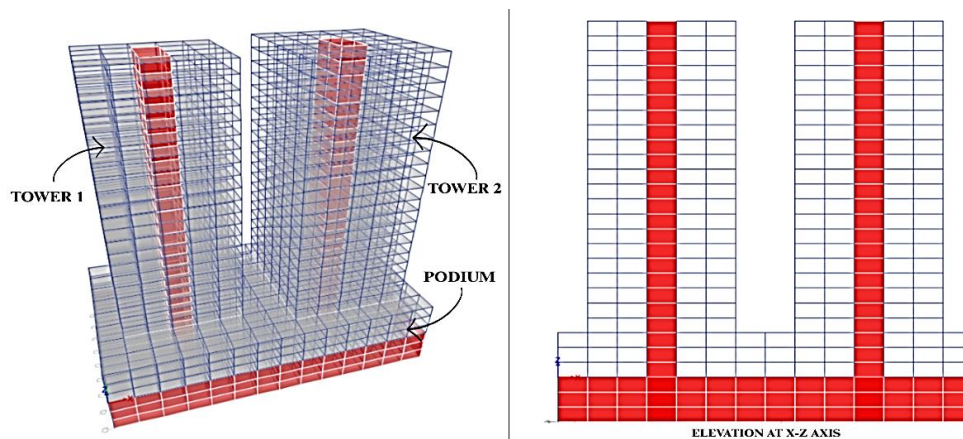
3D view and elevation of model with retaining wall at basement floors.
